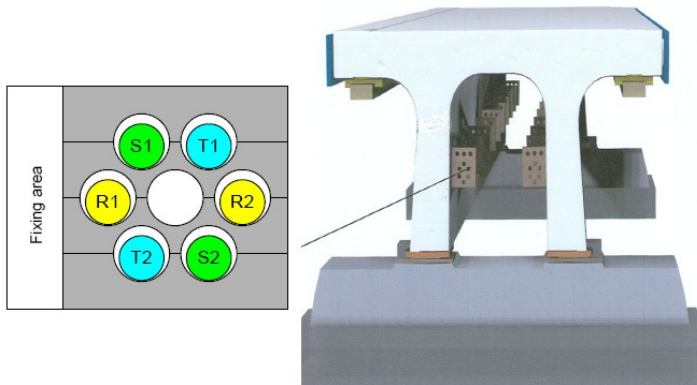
Bögl guideway beam with integrated cable clamp (schematic diagram with occupation of the feeder cables)
